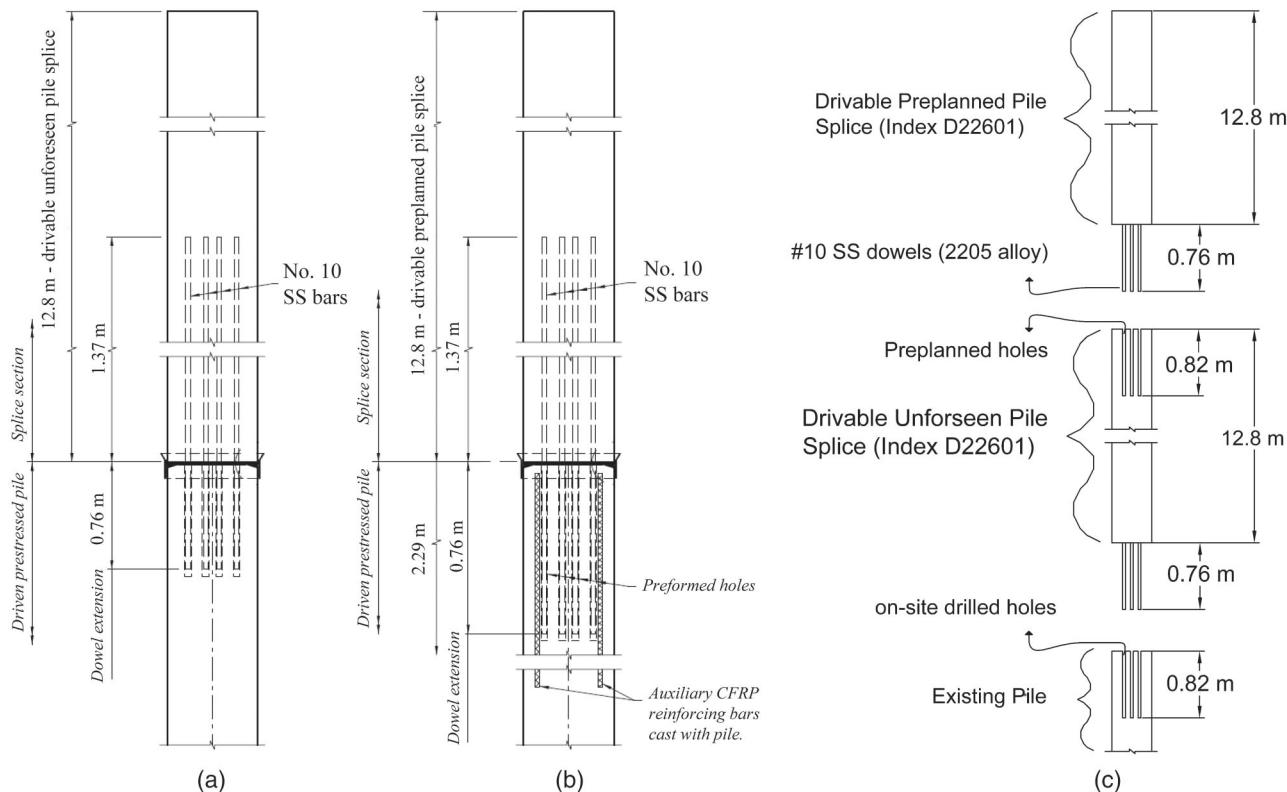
(a) Drivable unforeseen PC pile splice detail; (b) drivable preplanned prestressed/precast pile splice detail (data from FDOT 2014a); and (c) pile splice installation sequence.
